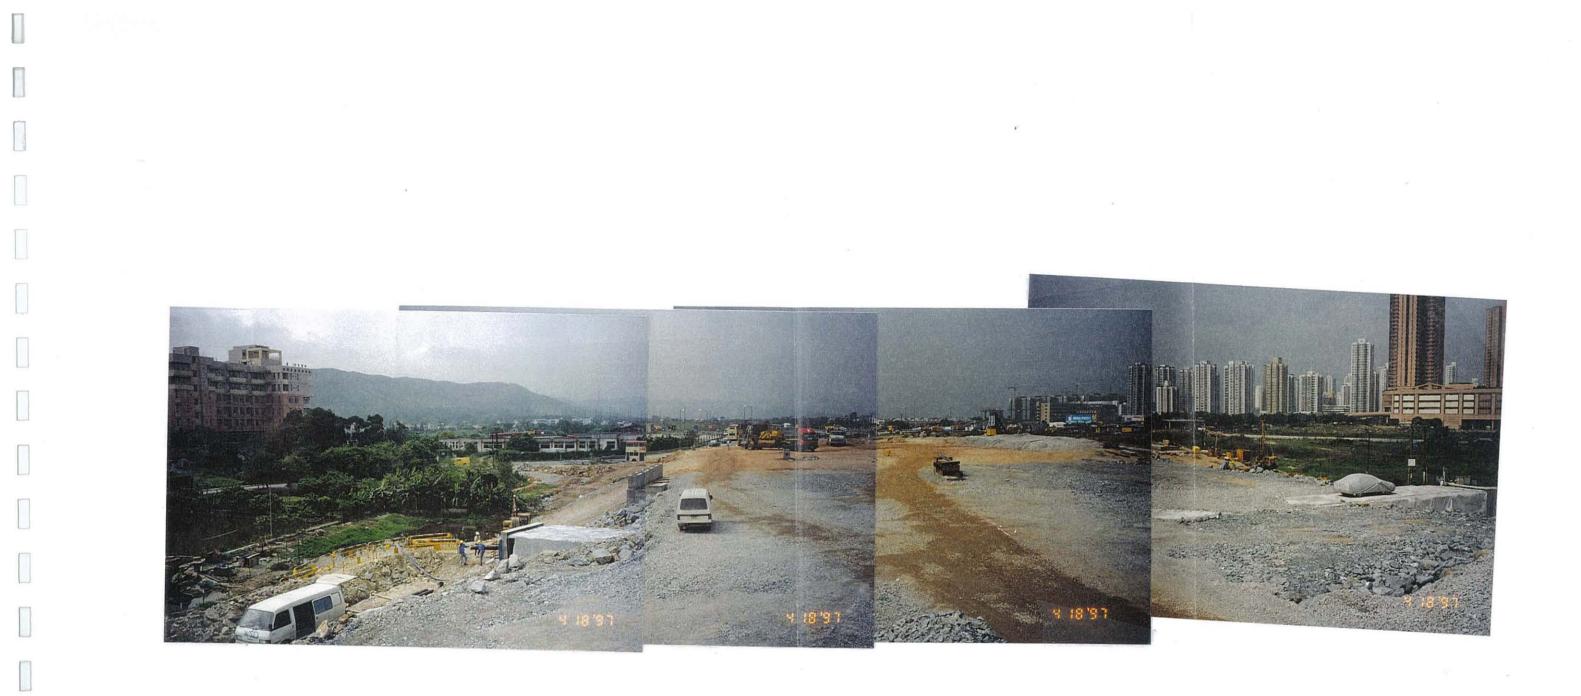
Construction of Route 3 C P Section near the Pok Oi Interchange. (View: north to south, location 1)
